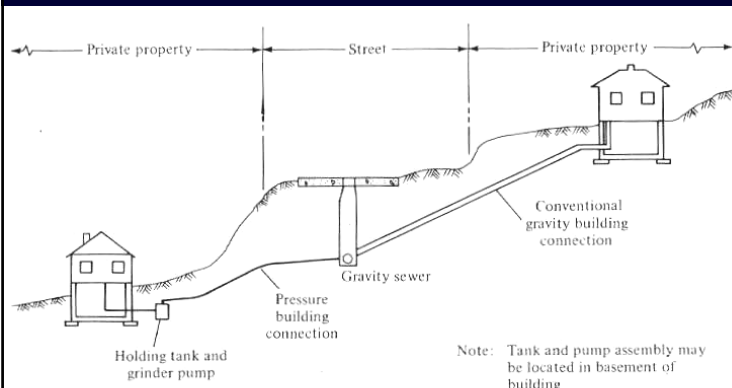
Typical pressure connection to gravity sewer from isolated low building site.
